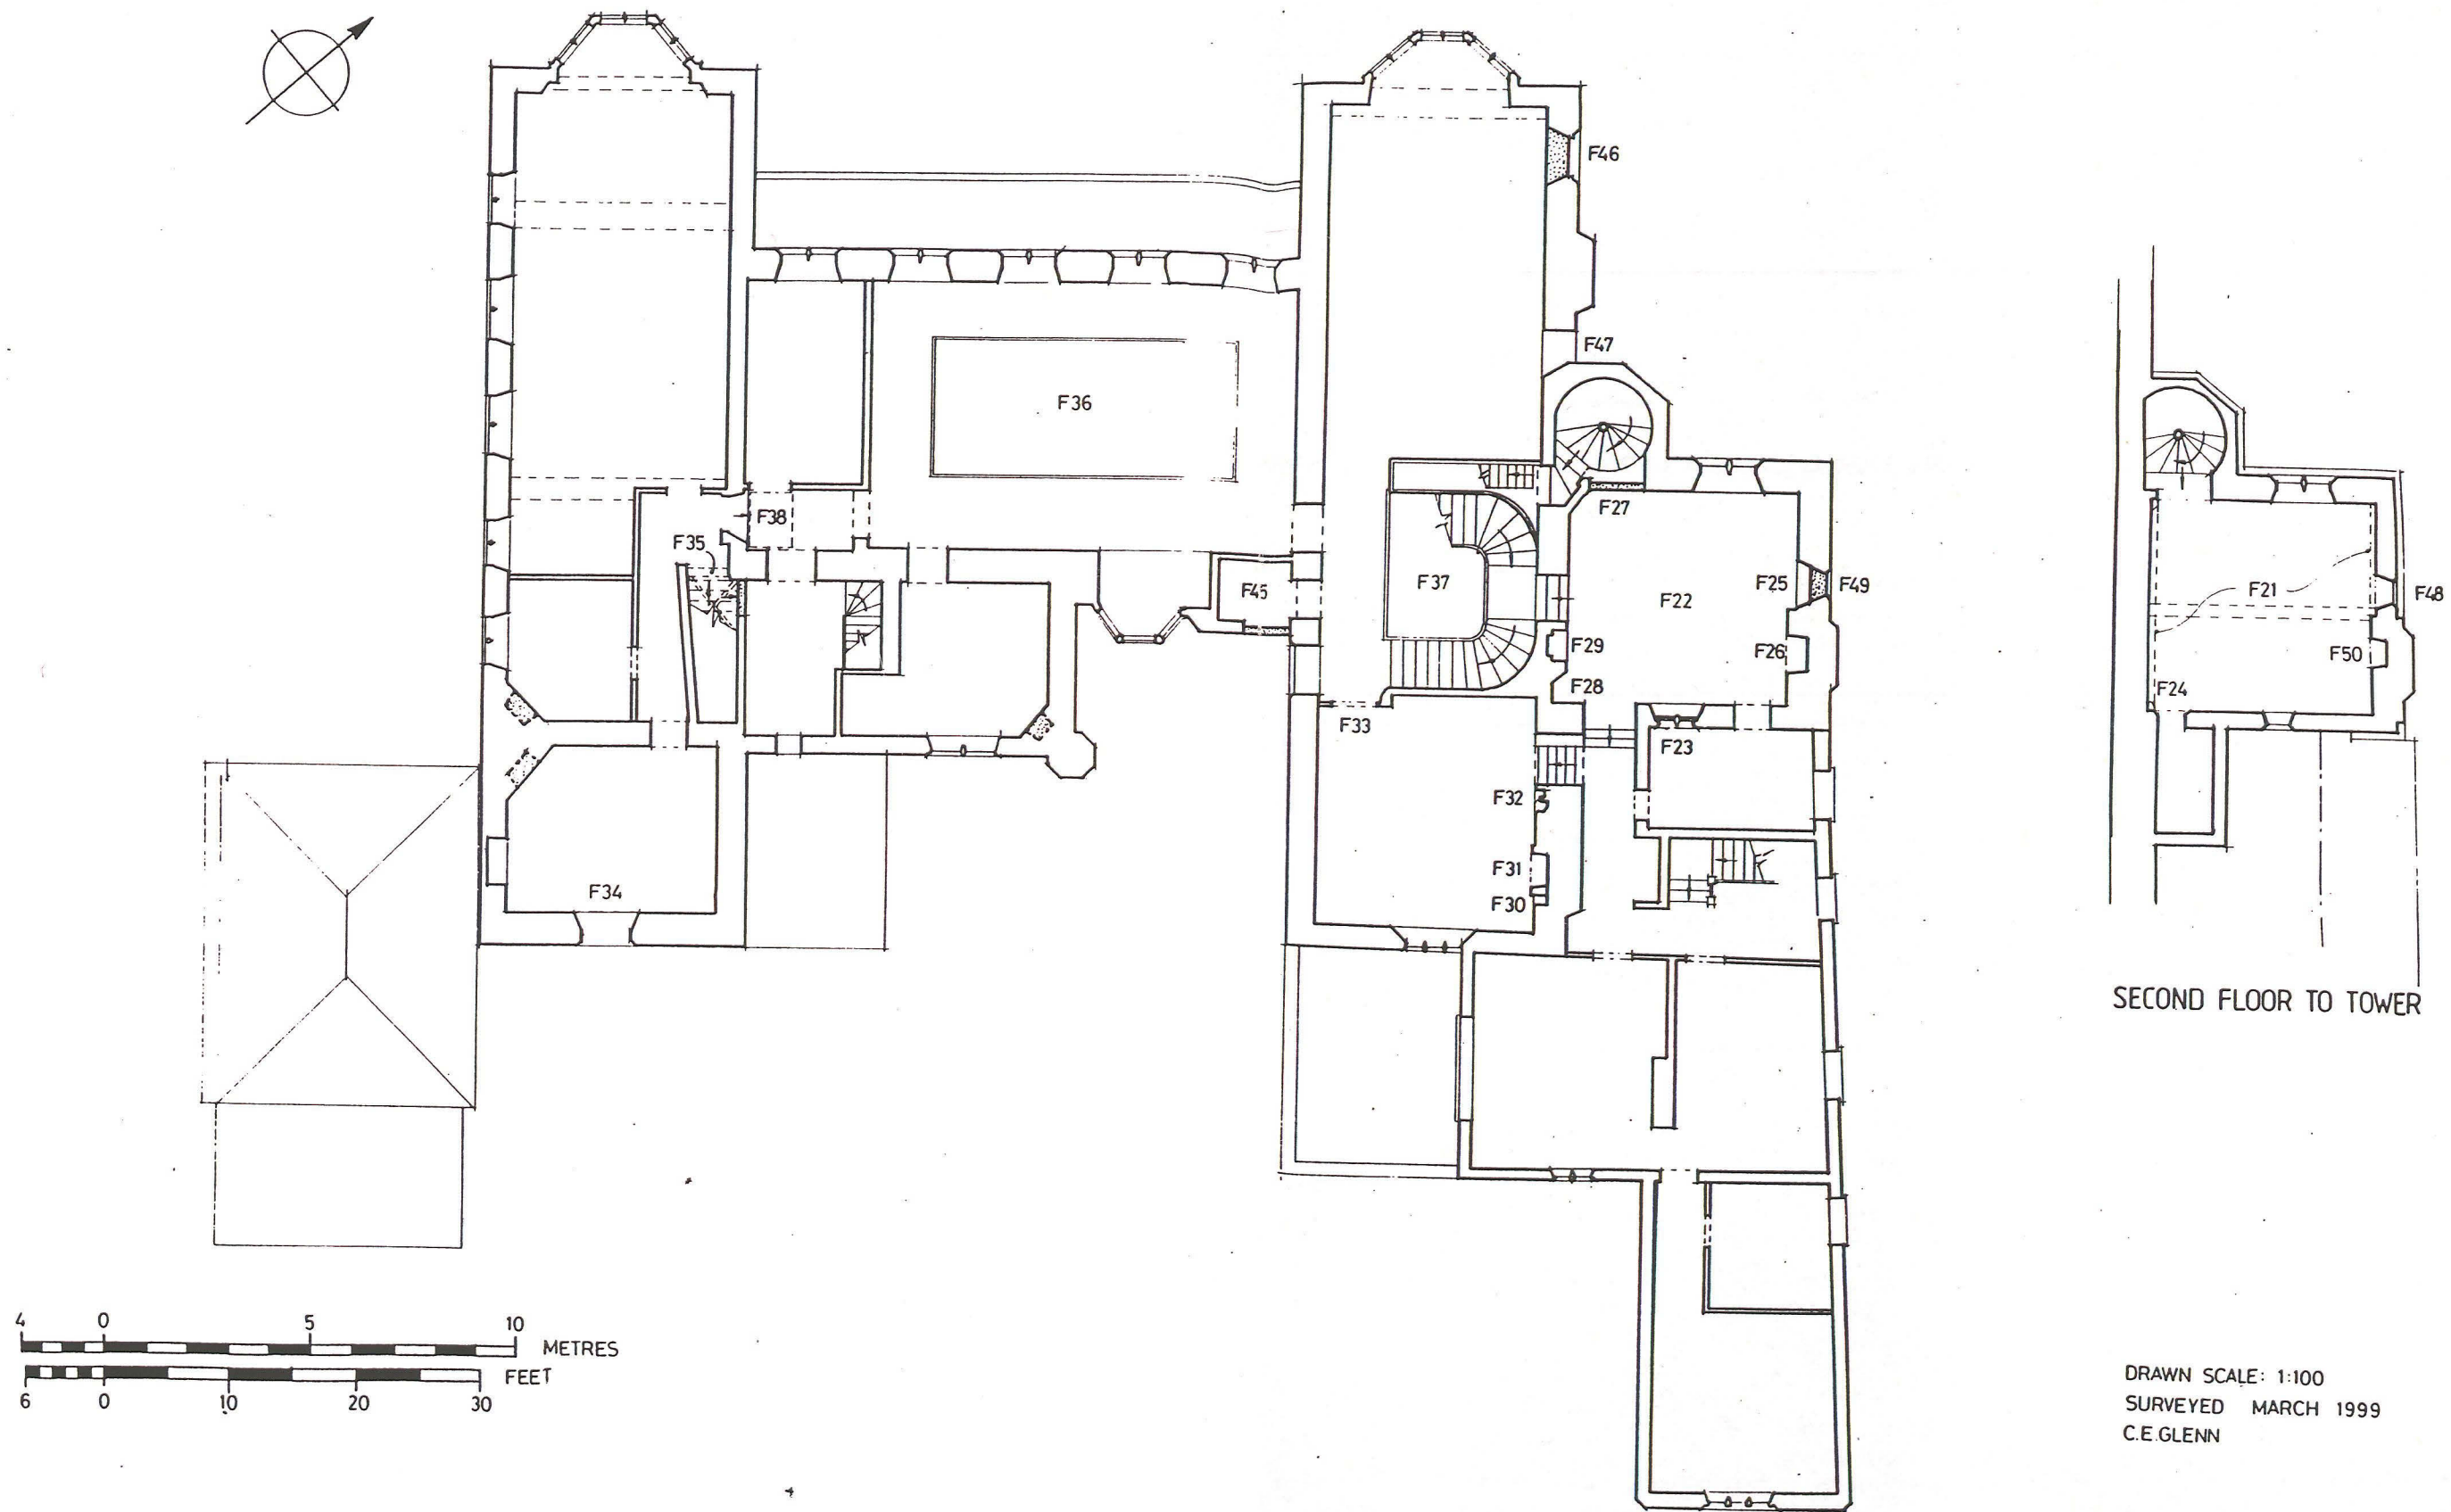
Ayscoughfee Hall, upper floor plan with location of features
